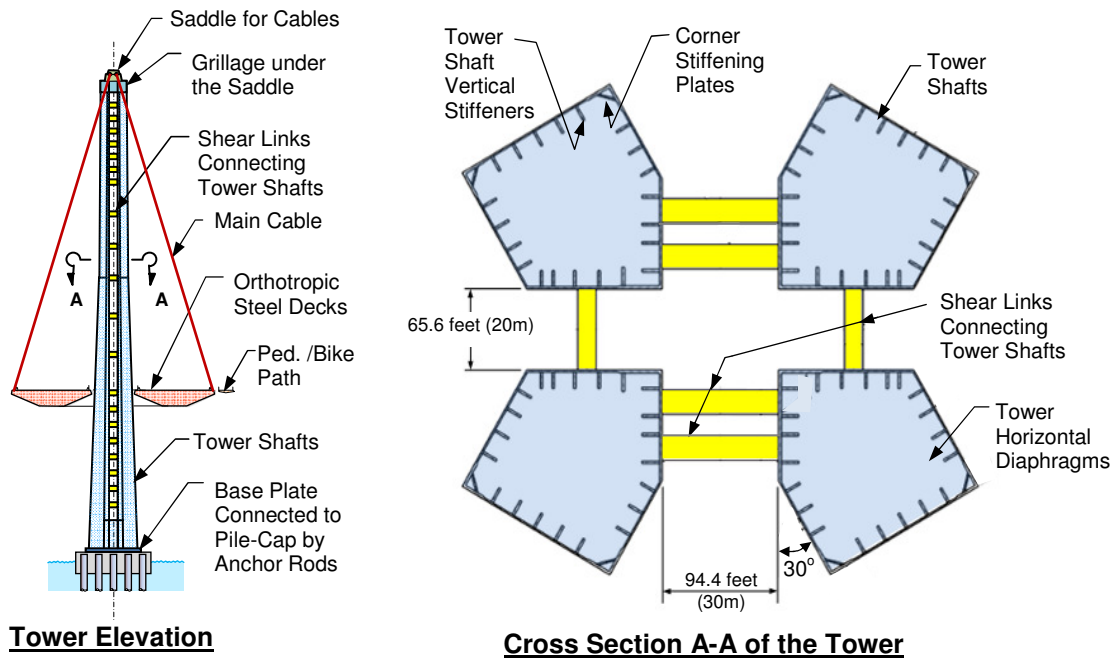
Elevation and Cross Section of the Tower of the SAS Bay Bridge
